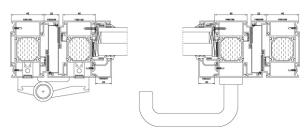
Horizontal cross-section of EI30 window (similar to EI15 and EI60)
